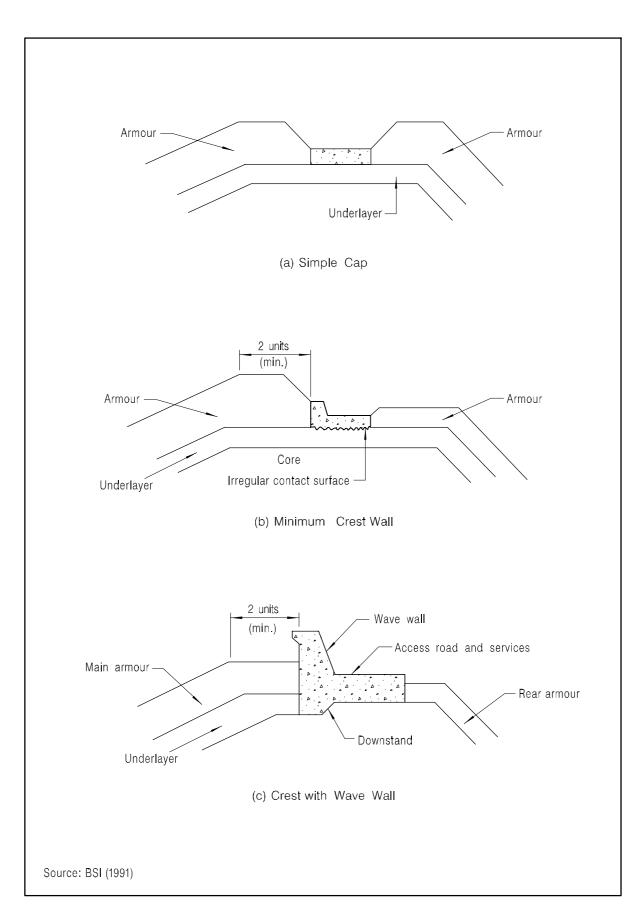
Typical Crest Structures for Rubble Mound Breakwaters
